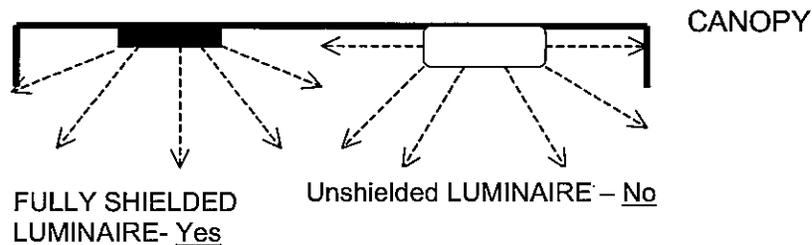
Building canopies, overhangs, roof eaves and similar types of construction shall not be considered as the means for providing the light cutoff. The cutoff characteristics shall be achieved by the LUMINAIRE itself.
